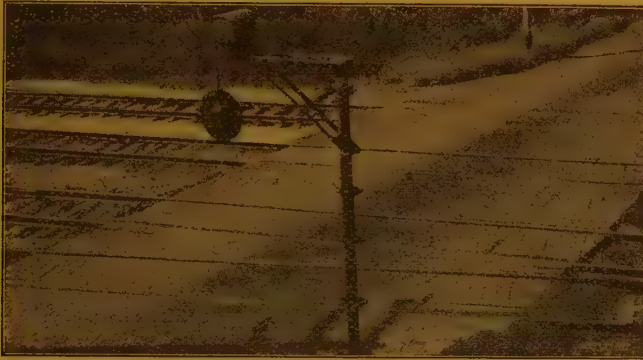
Preformed asphalt plank on a four-track crossing.
